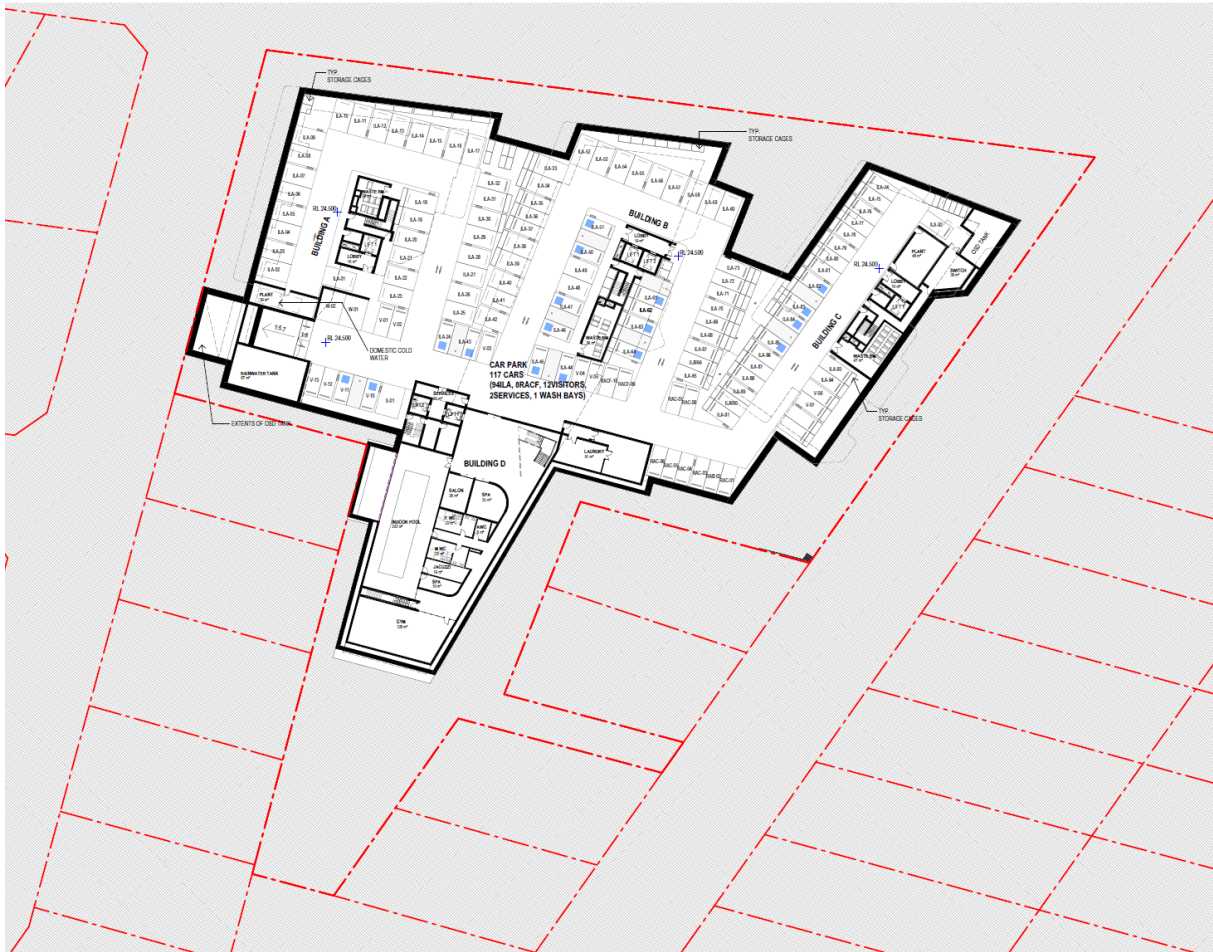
Site plan showing extent of proposed basement carpark. (Source: Jackson Teece 2024)
